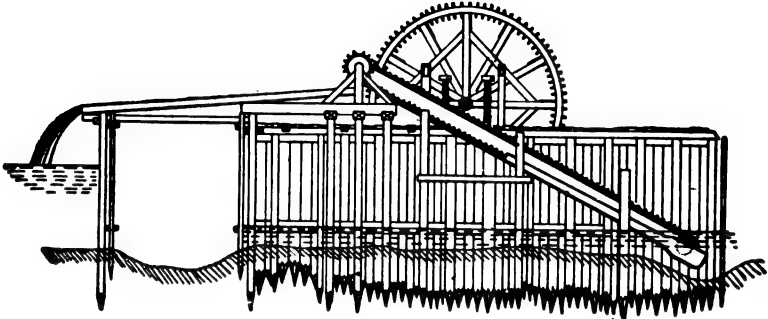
OLD CHAPELET, SIDE ELEVATION.
